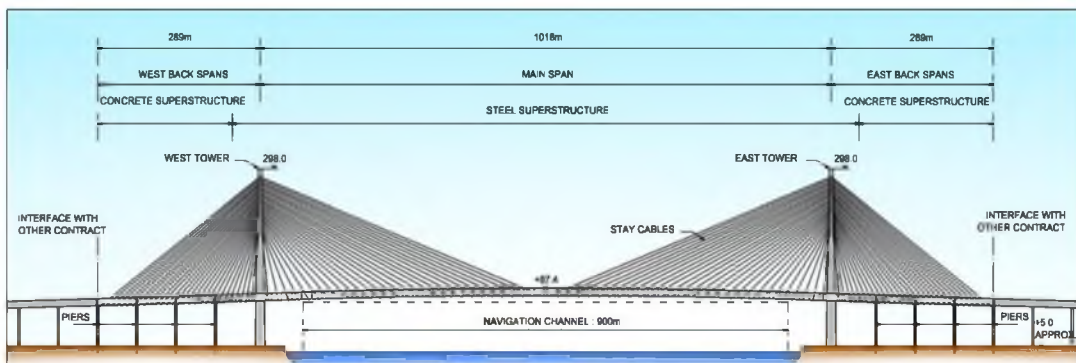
Cable Stayed bridge elements, (Sham and Wyatt, 2016)
